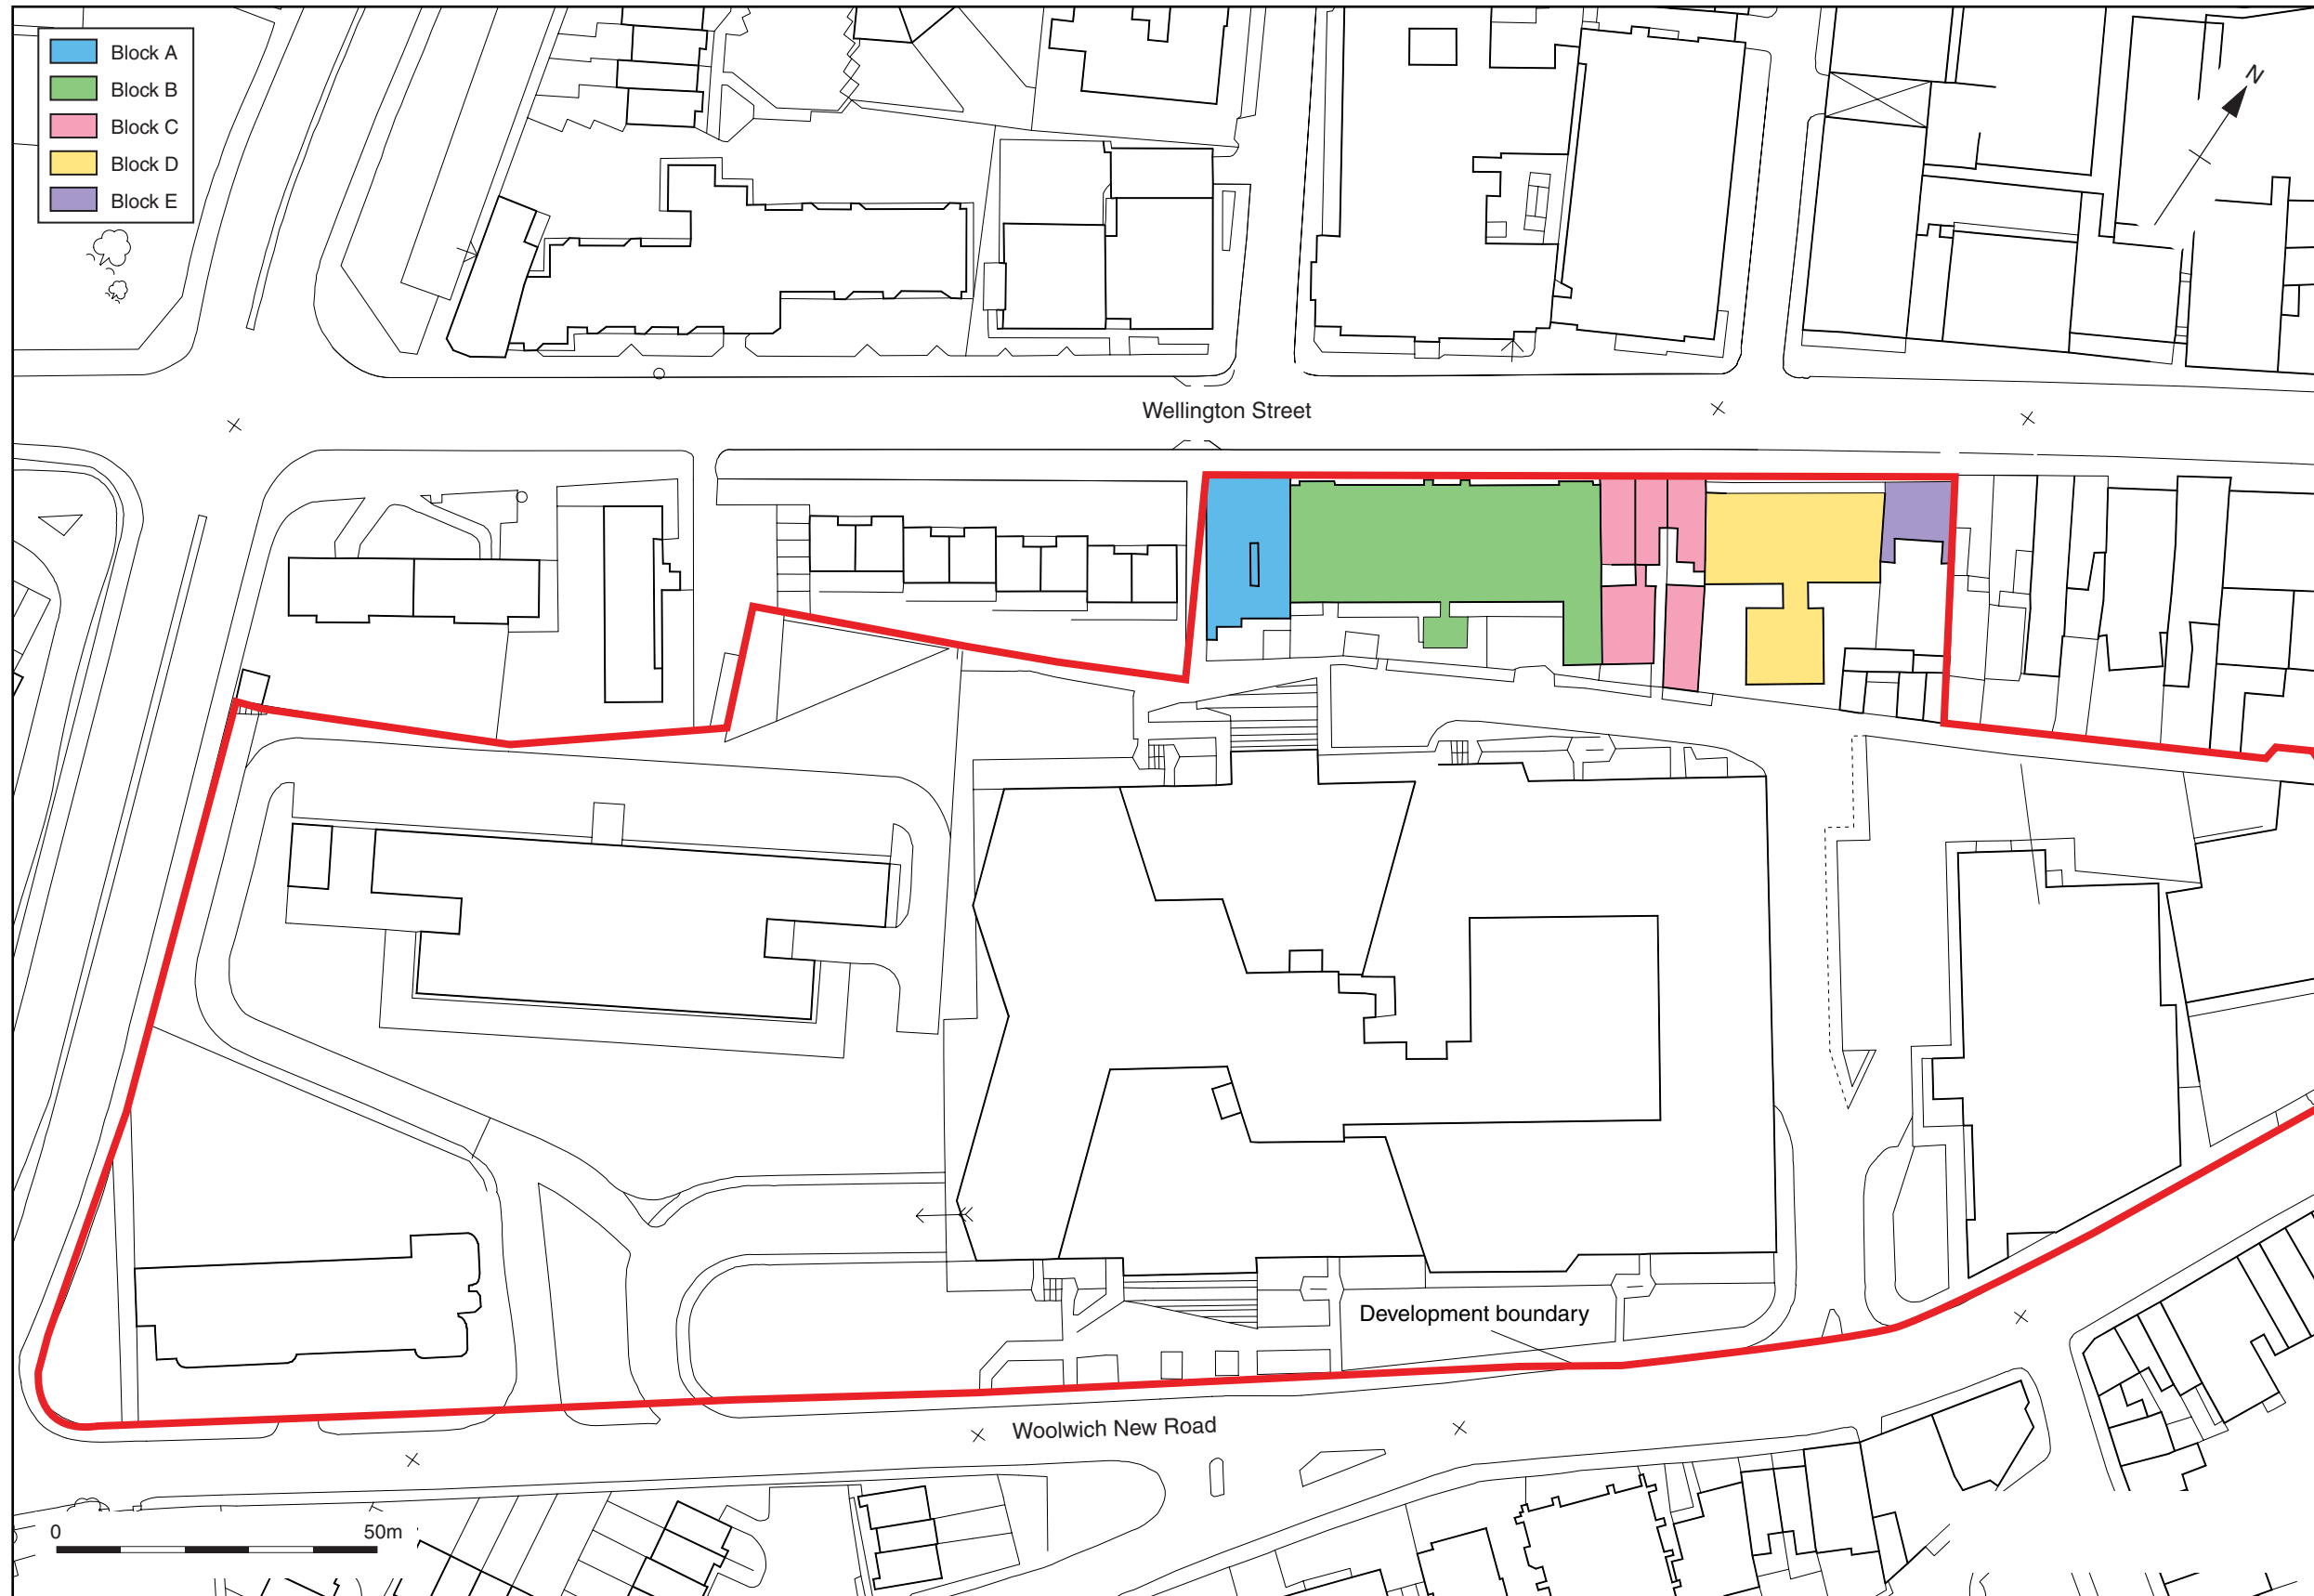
Site plan showing buildings recorded (based on survey drawings by HLM ARCHITECTS)
